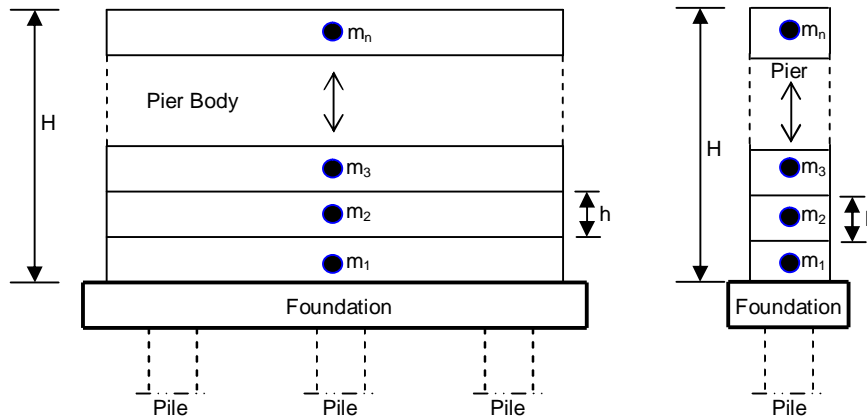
Splitting single shaft piers into horizontal strips with lumped masses
